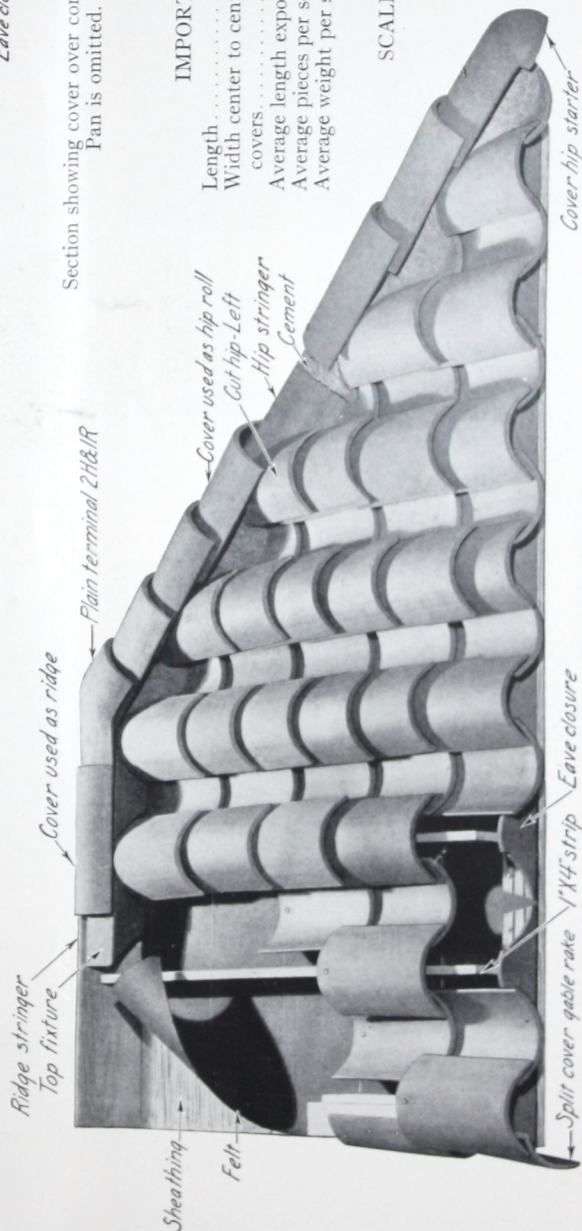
# DETAILS OF IMPERIAL STRAIGHT BARREL MISSION TILES AND FITTINGS
